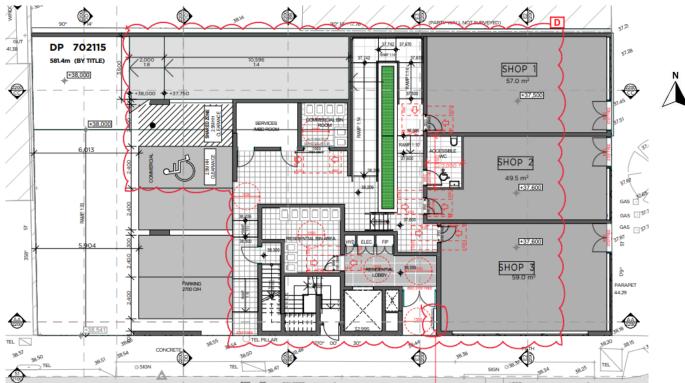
Ground floor plan of the development, as currently approved. Source: Urban Link Architects.
